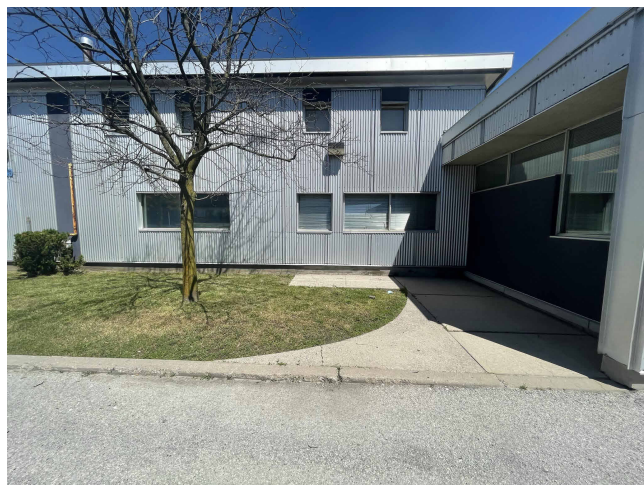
PARKING LOT AT FRONT ENTRANCE
